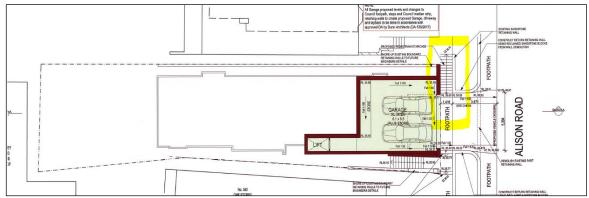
Issue K Proposed Garage Plan with Council steps highlighted (Urban Moose)
